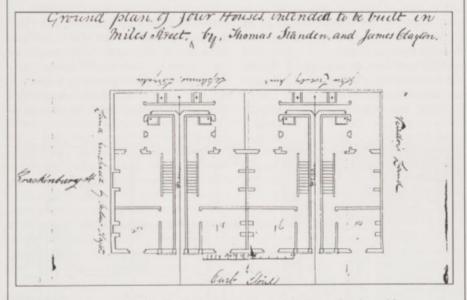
Parlour houses: a building plan for four houses to be built by Thomas Standen and James Clayton in Miles Street.
